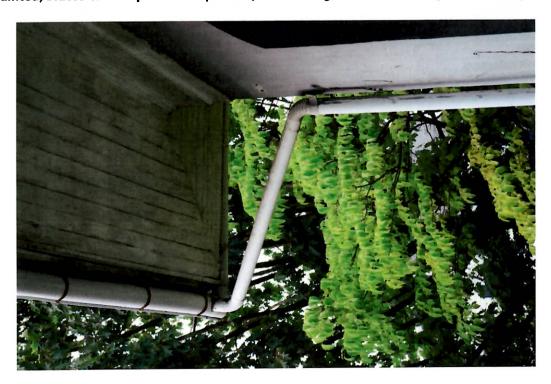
08/05/19. Side (west). Project area. Detail of wood ceiling, trim, and molding to be repaired and painted; stucco to be repaired and painted; aluminum gutters and downspouts to be repaired.
